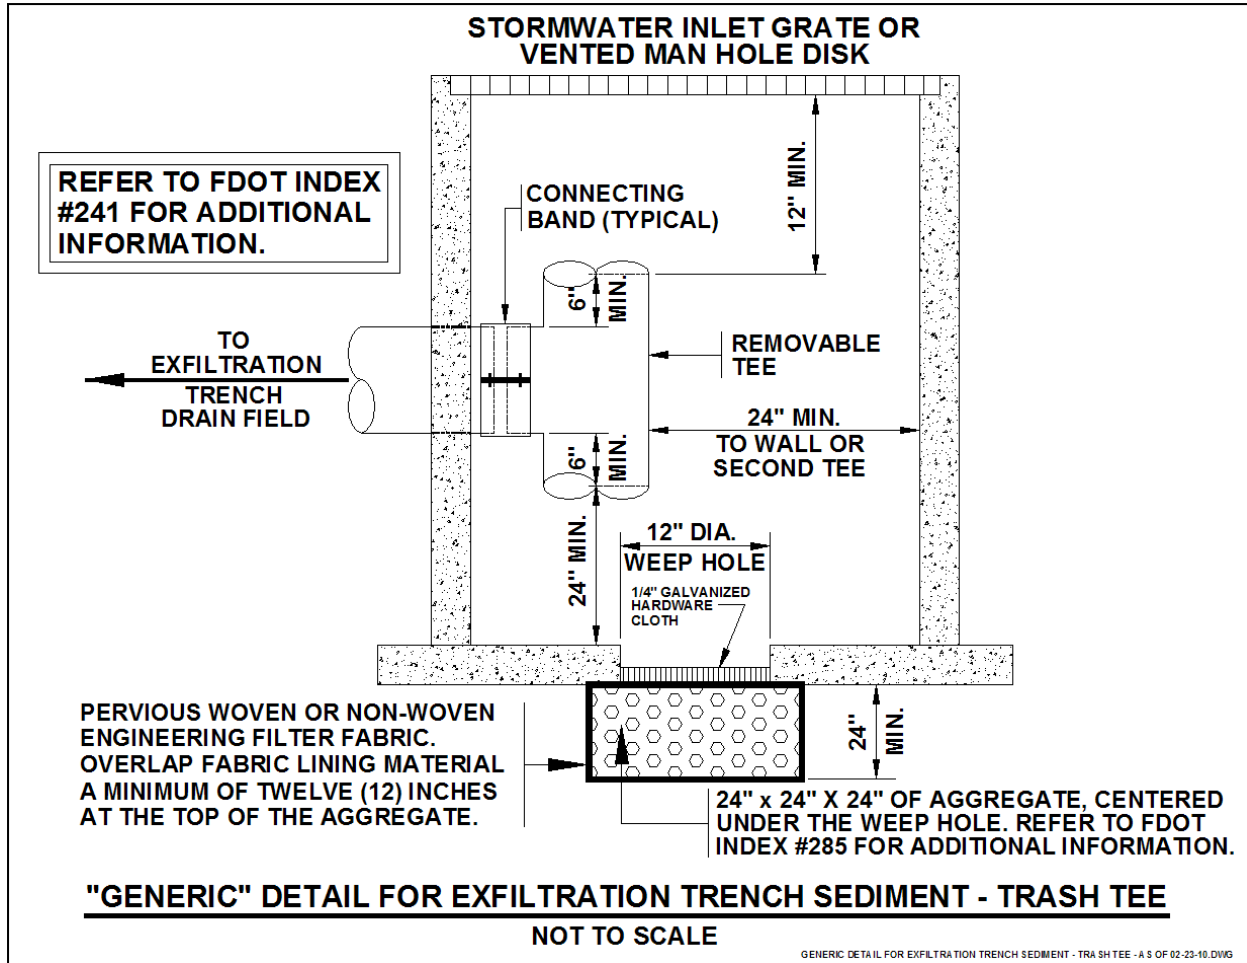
Generic Detail for a Typical Exfiltration Trench Trash Tee
